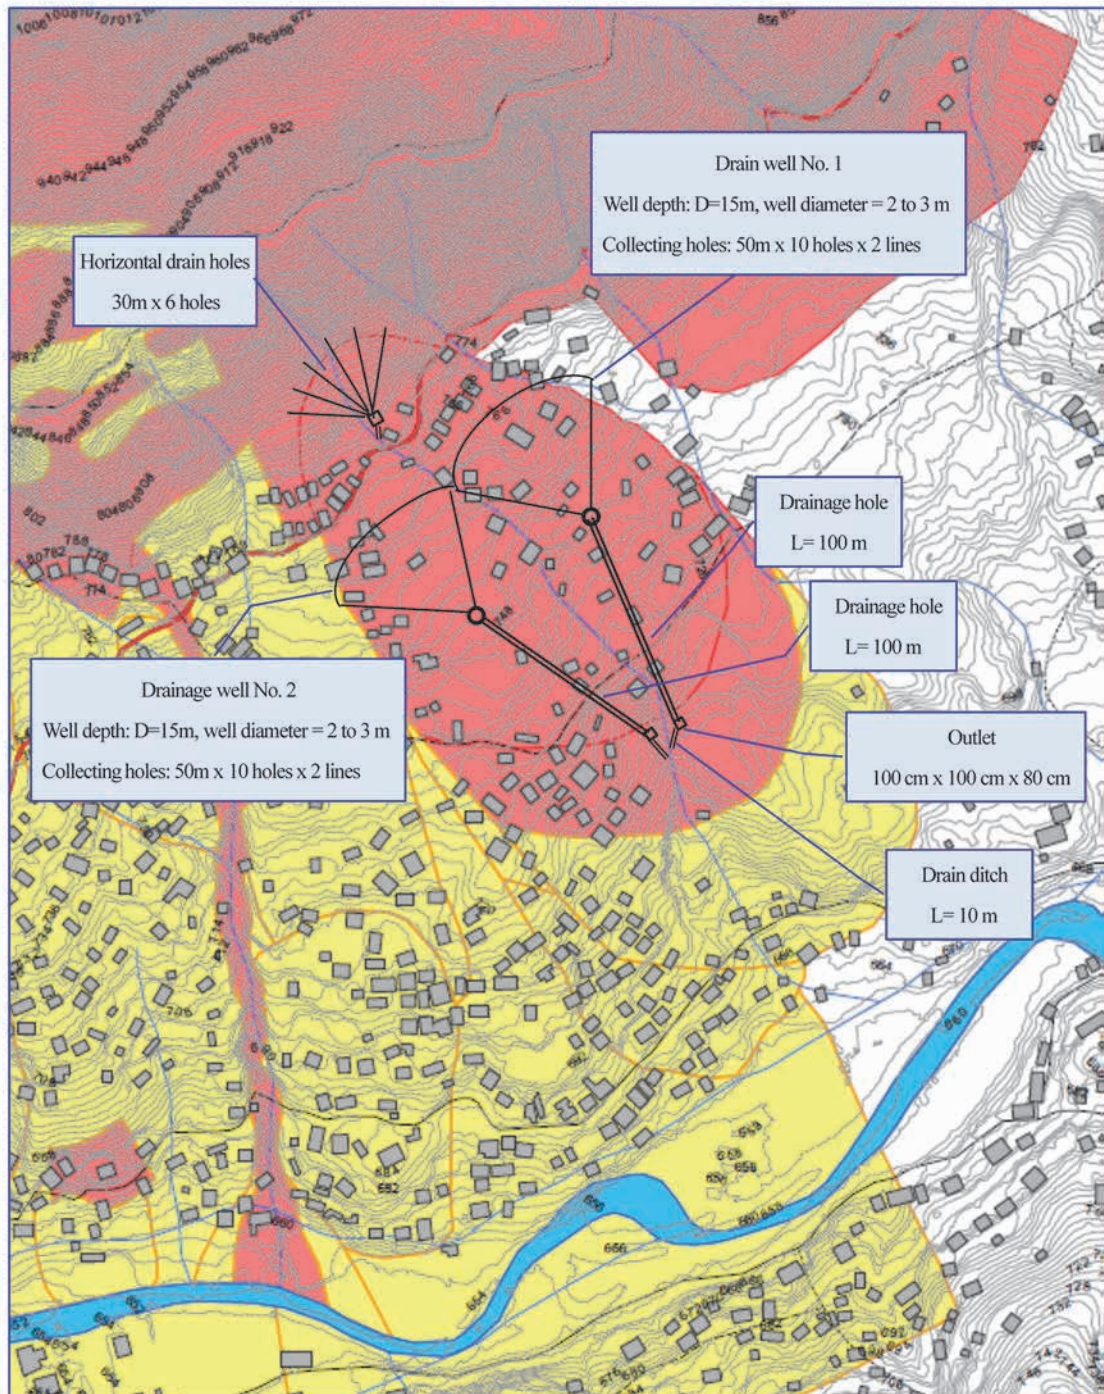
Layout of the Planned Structural Measures for Site 4 in the Weeriyapura Pilot Site
